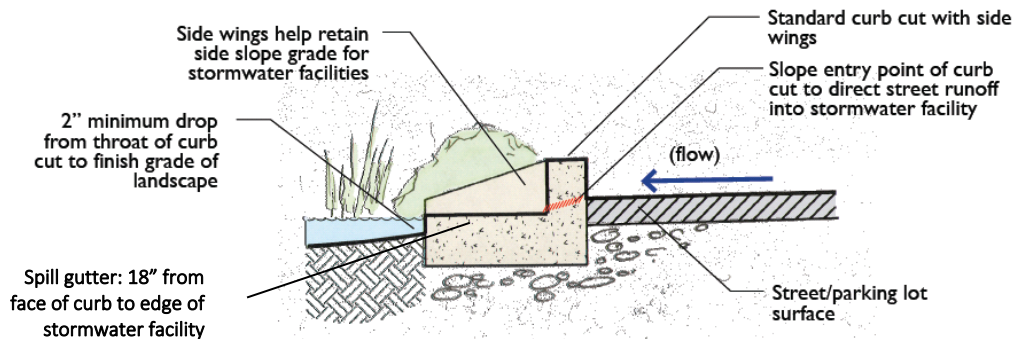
Standard curb cut with side wings: cut section view (Source: SMCWPPP, 2009)
